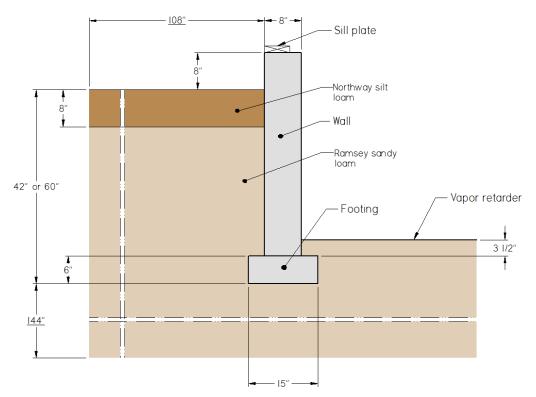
Retrofit crawlspace foundation vertical section (without insulation)
